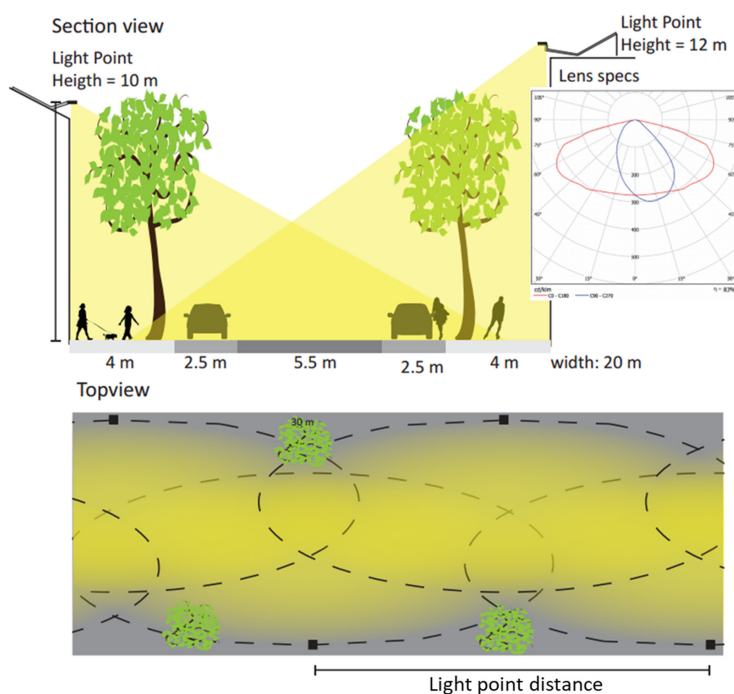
Light design proposal with small and asymmetric beam to avoid light shining into houses.
